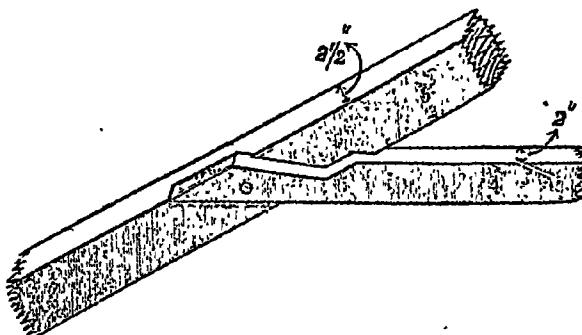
is a sketch of the joint between a collar beam and a rafter. The end of the collar beam is joined to the rafter by a dove-tailed notch. The joint is further strengthened by a trenail.
